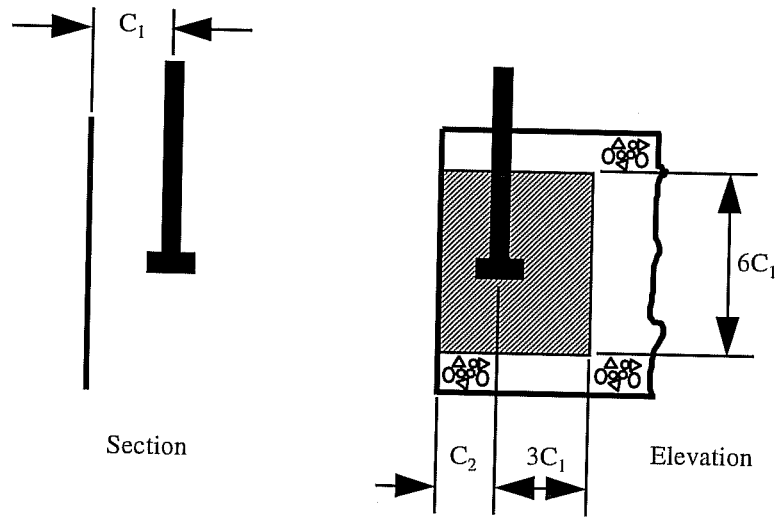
CEB Blowout Failure Area for Corner Placement
